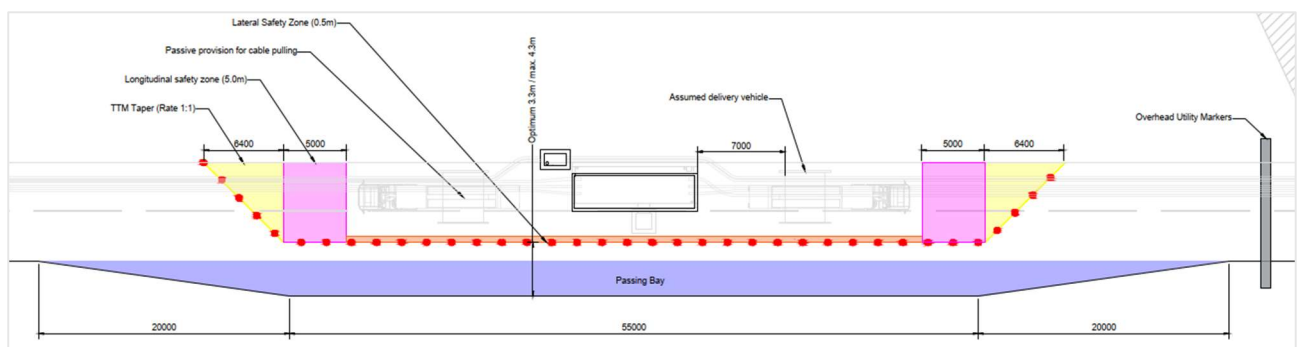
Proposed Traffic Management and Passing Bay Arrangement for a Joint Bay in the Roadway (Indicative Layout)
